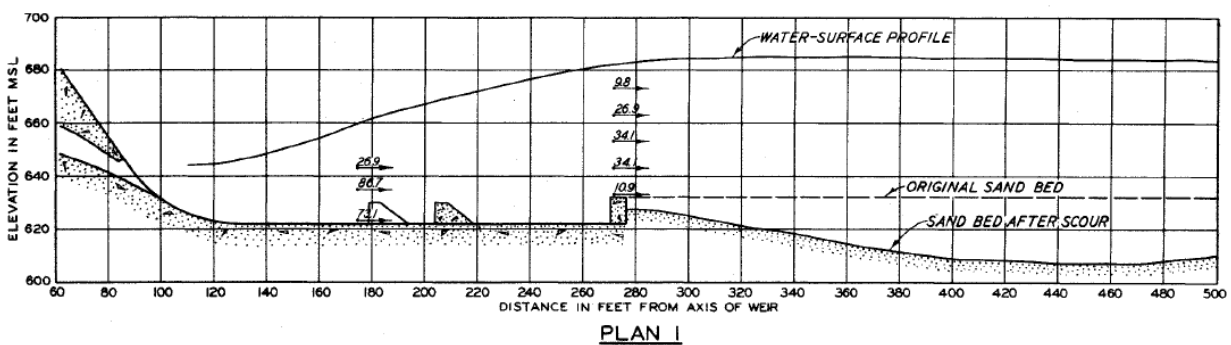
Keystone Dam Model Study Typical Profile (Source: USACE, 1960)
